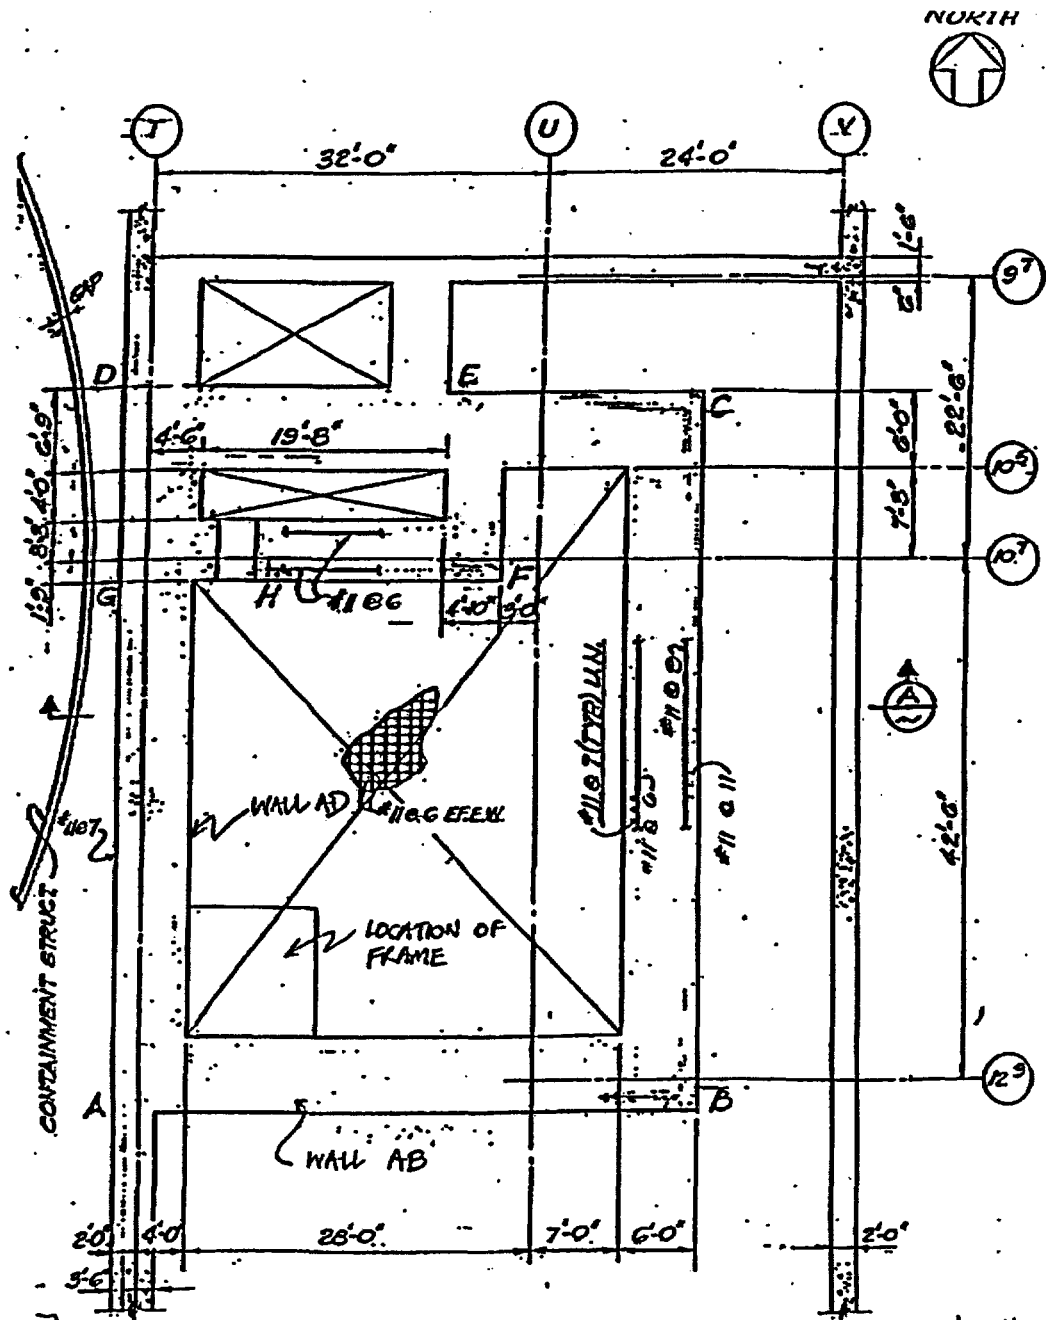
Plan View of SFP Walls (Unit 1 shown)
